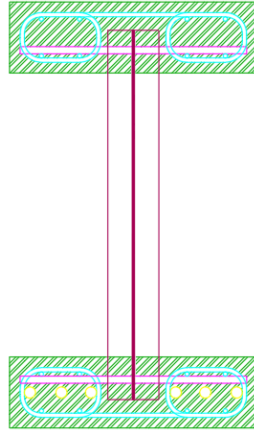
Cross-section example 'composite' I-girder with a corrugated steel web
